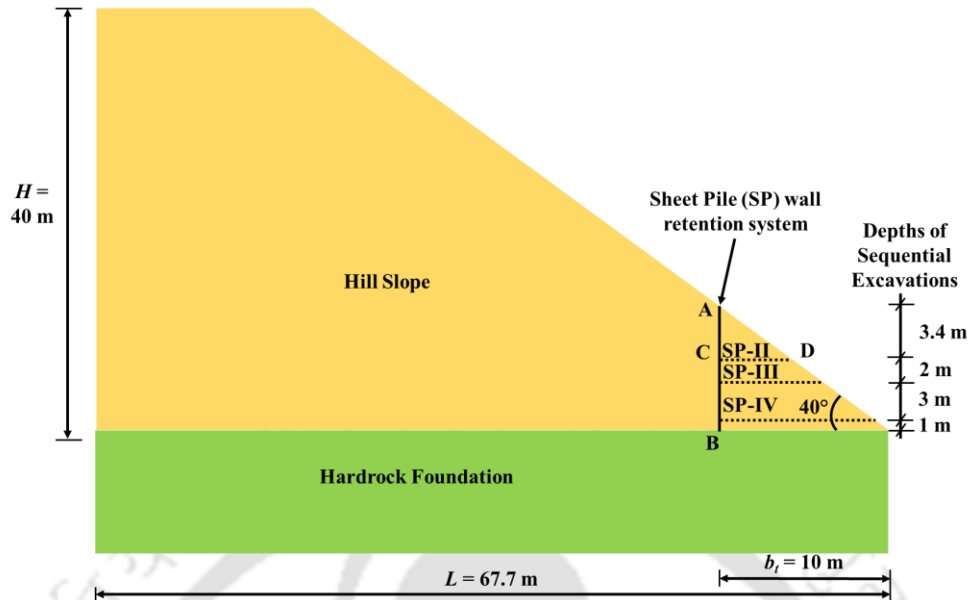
Schematic diagram of sheet pile (SP) wall used as retention measure against the sequential toe excavation of the hill slope
